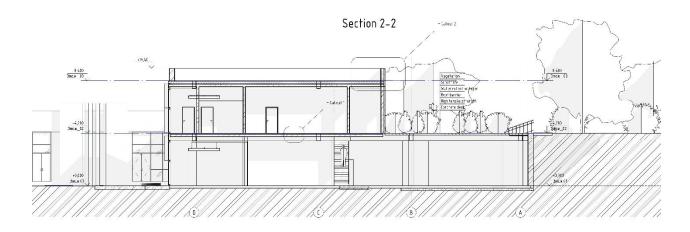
Section 2-2 with callouts nodes (Source: Author's drawing)
